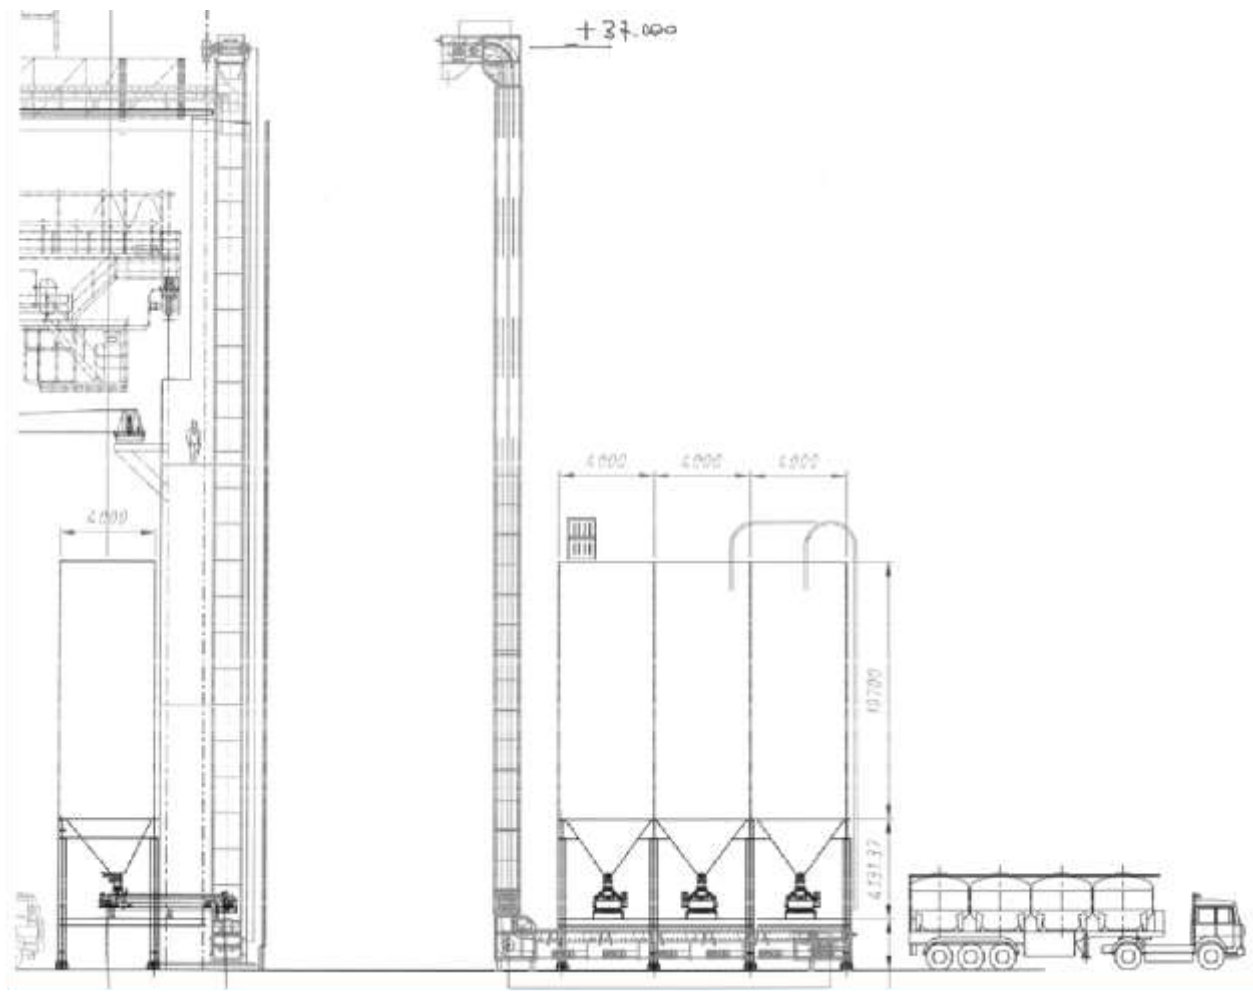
elevation view of the EAF fluxes material handling system
